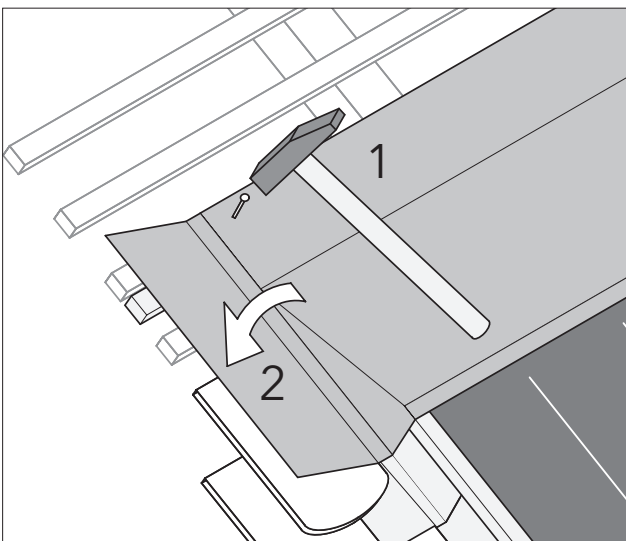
Nail upper flashing sheets onto battens and adjust standing up sheet at the corners as described before.
